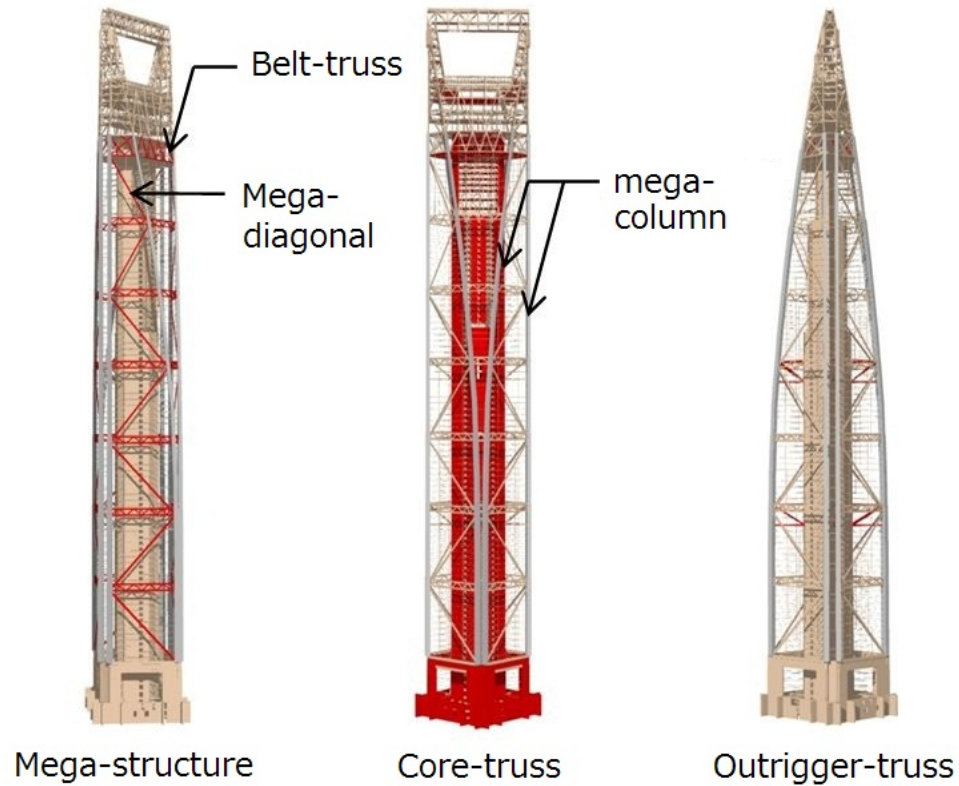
Shanghai WFC structural system elevation views (<http://www4.kke.co.jp>)
